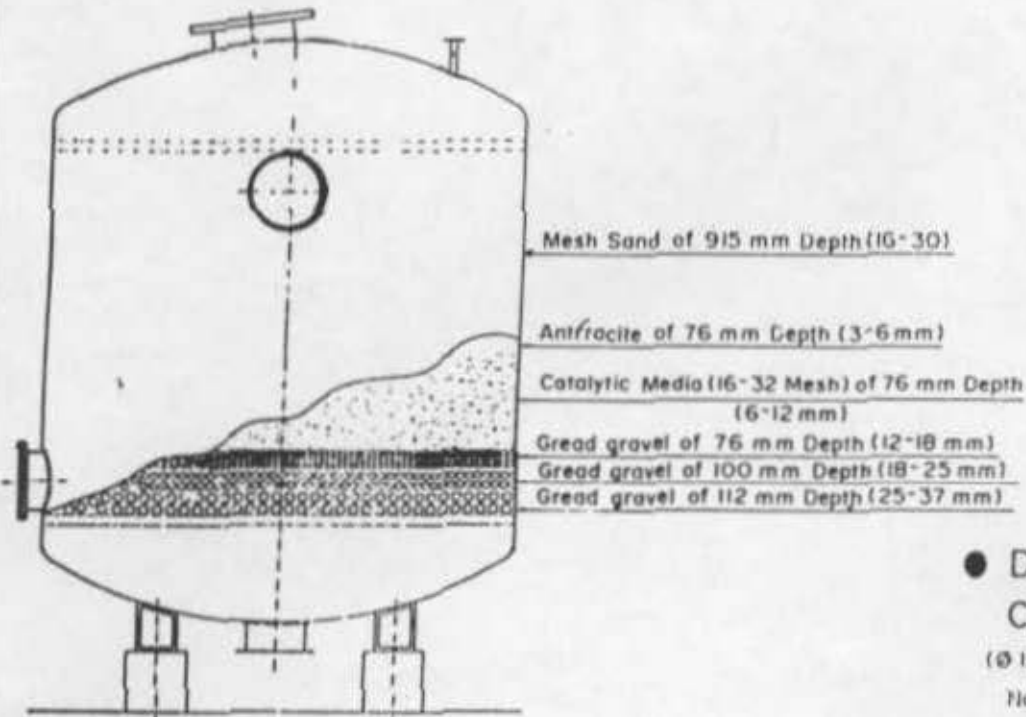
DETAIL OF WATER TREATMENT PLANT AT BRAC-
